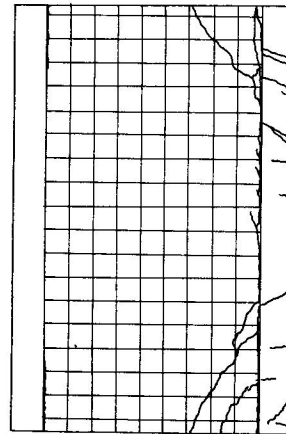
FINAL CRACK PATTERN OF PANEL B
